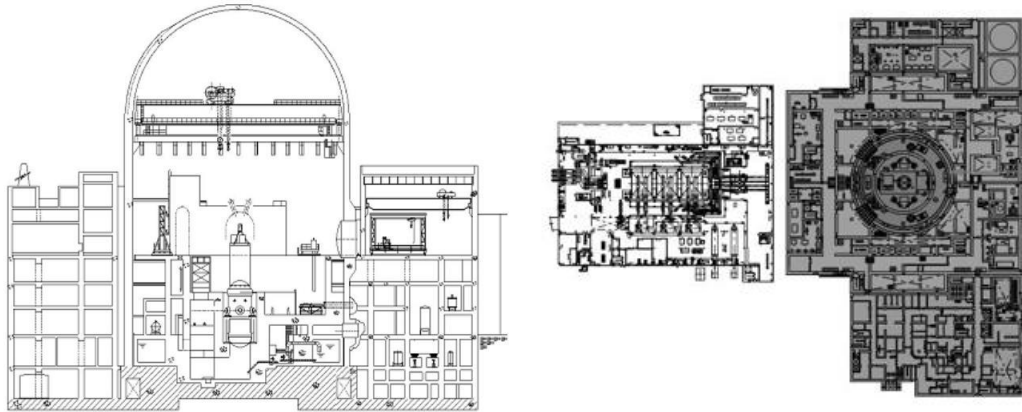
Cross-section and plan of the APR1400 reactor [17]
